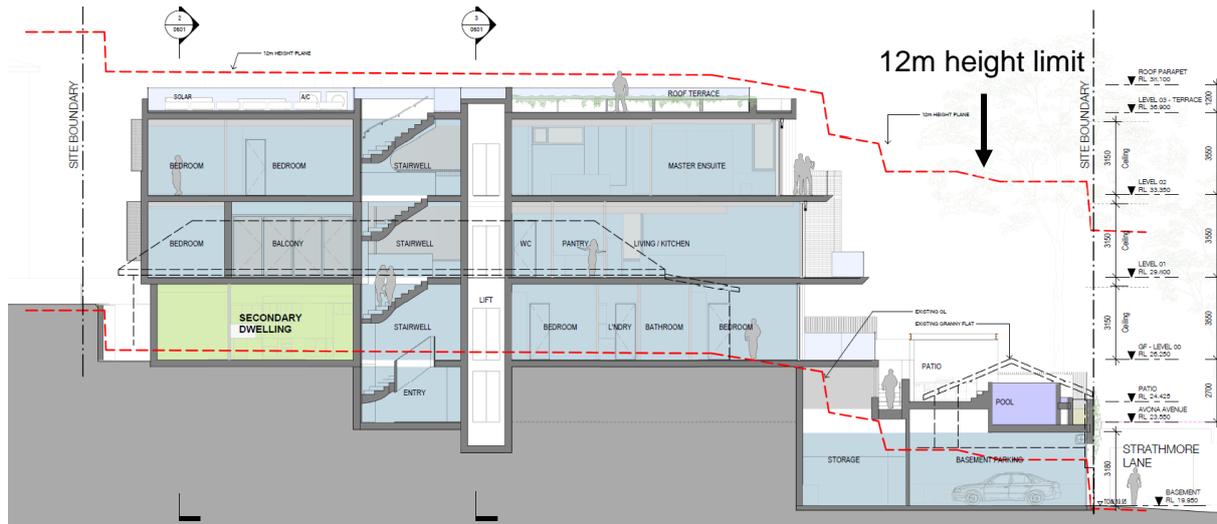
Proposed section through the site (east-west) indicating the 12 metre maximum building height limit and the height in storeys of the development
